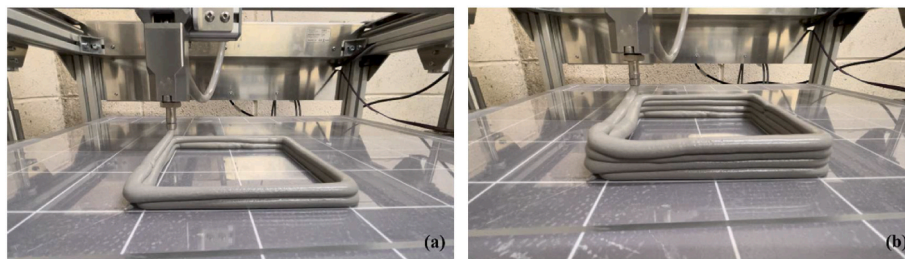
Extrusion-based 3D printed component showing up to the: (a) 3rd layer and (b) 5th layer.
